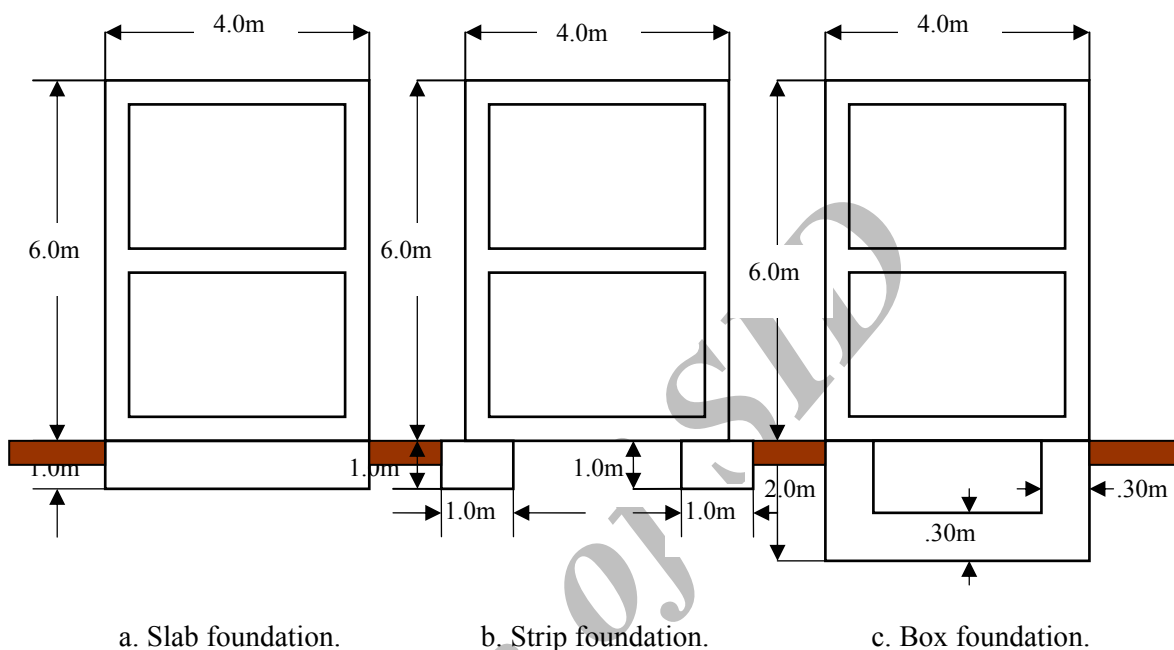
Geometry of the (a) slab, (b) strip and (c) box foundation.
